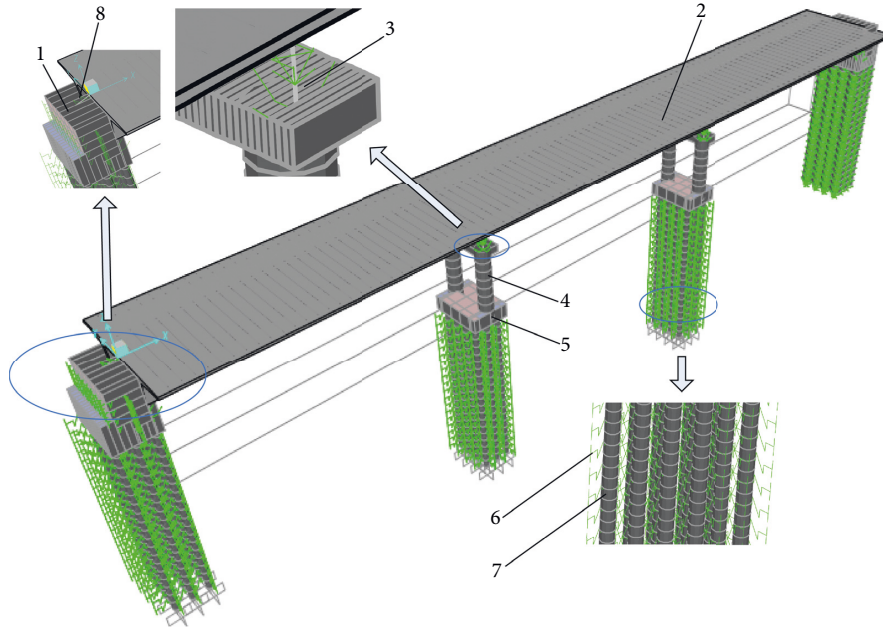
The finite element model of a three-span continuous bridge with FPS and structure-soil interaction. (1) Abutment; (2) main beam; (3) FPS; (4) pier; (5) pile cap; (6) soil; (7) subpile; (8) expansion joints.
